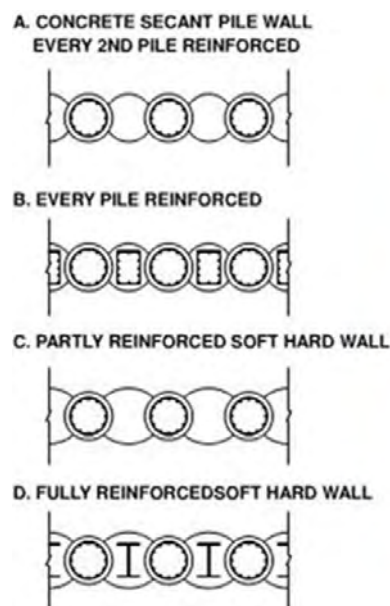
Construction of secant pile wall. From Bauer Group (2010).
